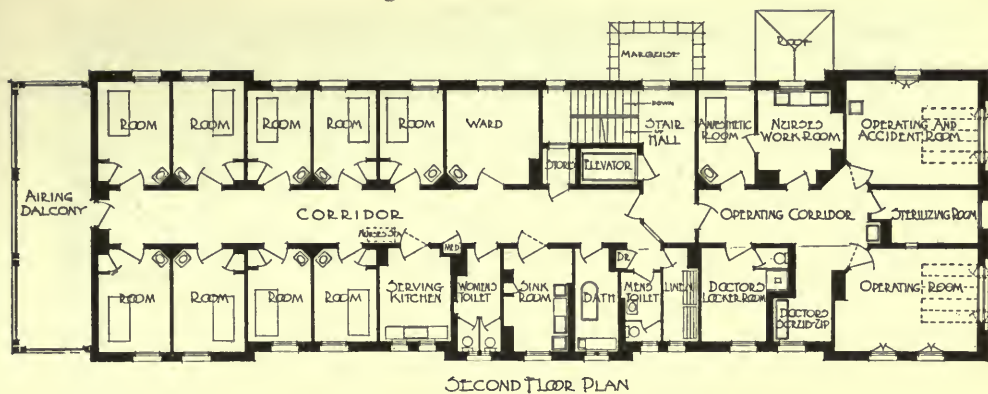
FLOOR PLANS—WHITE ISOLATION BUILDING, ST. LUKE'S HOSPITAL, JACKSONVILLE, FLA. EDWARD F. STEVENS, ARCHITECT; MELLEN C. GREELEY, ASSOCIATE ARCHITECT.
